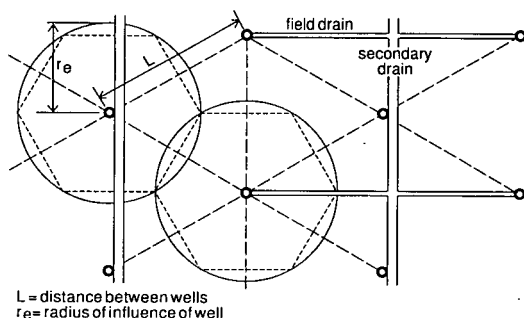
Wells in a triangular configuration with the required lay-out of field drains and main drains for the discharge of drainage water
